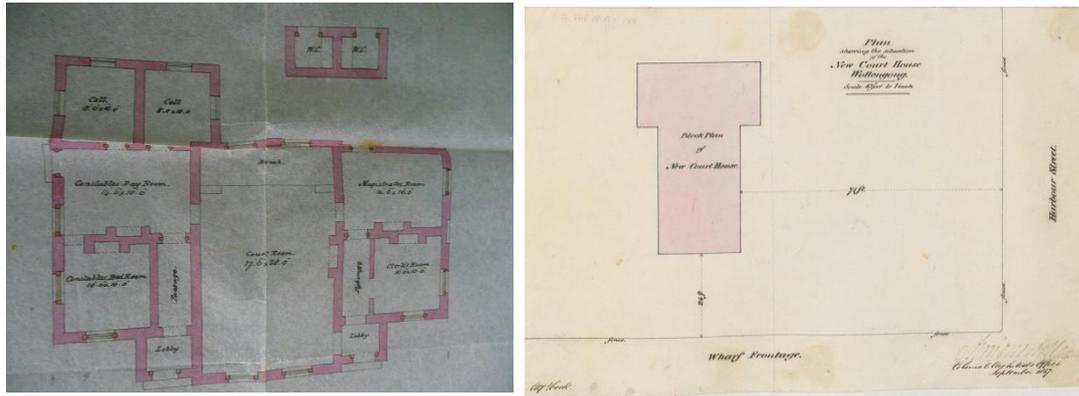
Colonial Architect plans – Original plan and elevations on the left and final, site plan only on the right
